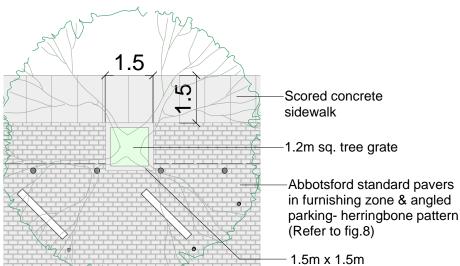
Tree Grate Detail - Ridgeway Avenue (North Side) and pedestrian walkway
